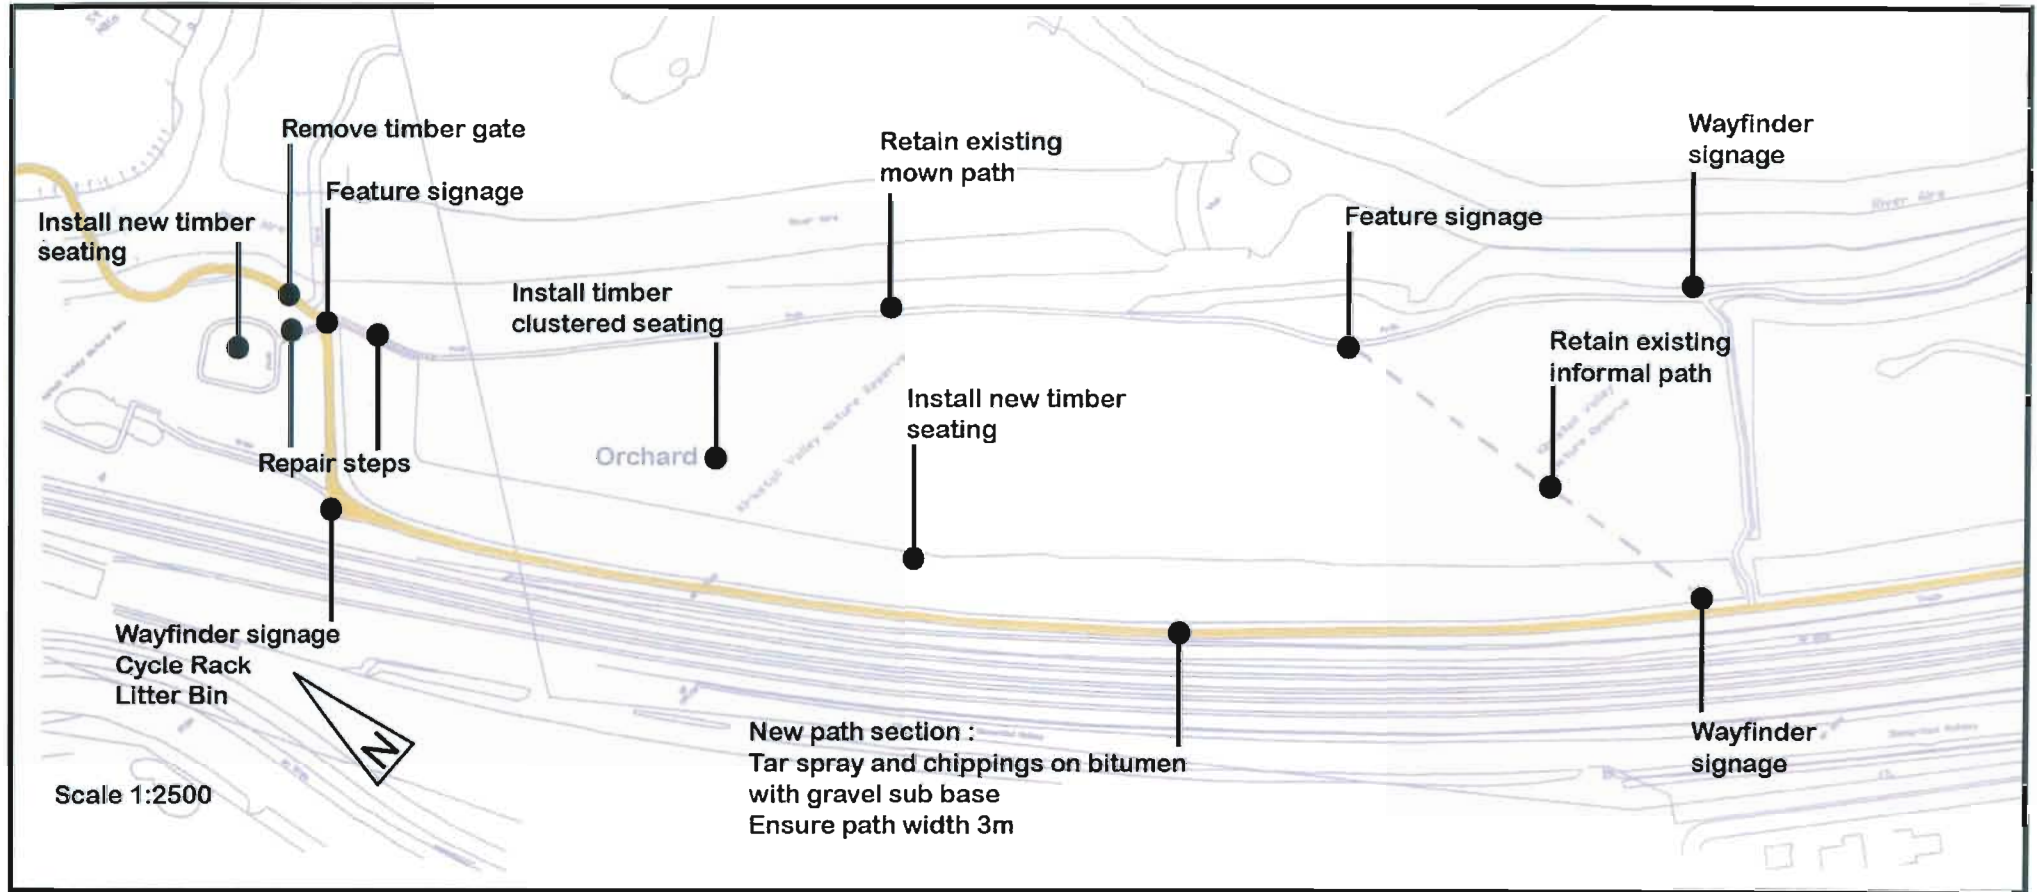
DETAIL A: BRIDGE ROAD TO ST ANN'S MILLS
